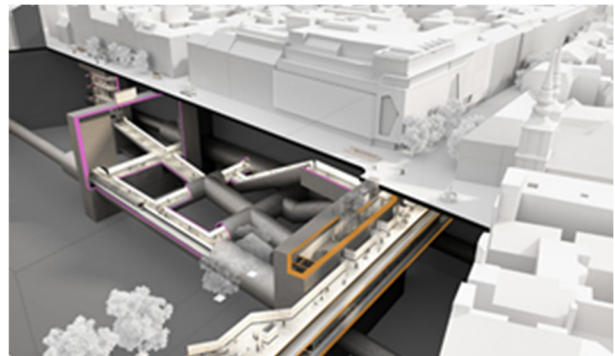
Overview of station Neubaugasse (Source: Wiener Linien)
